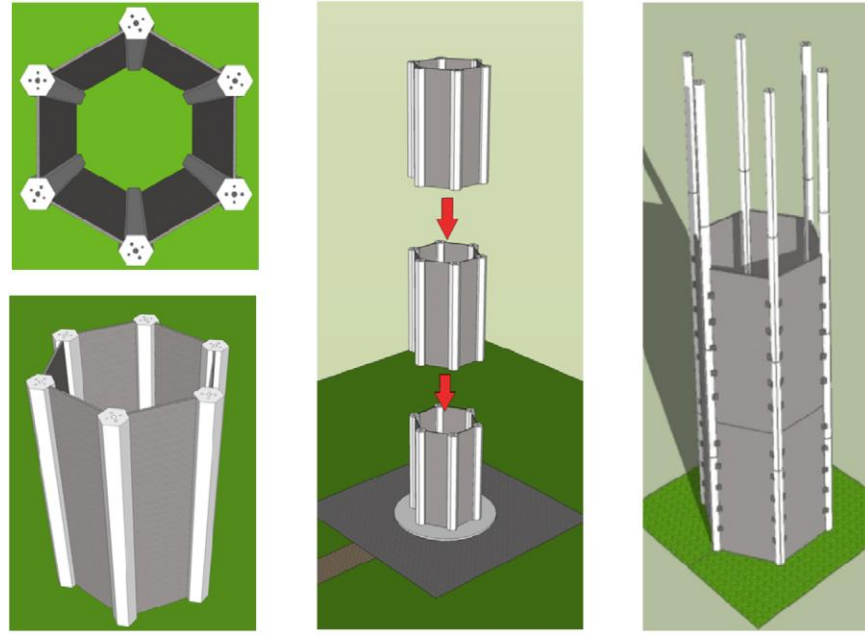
a) Tower cross section; b) Assembly method 1; c) Assembly method
